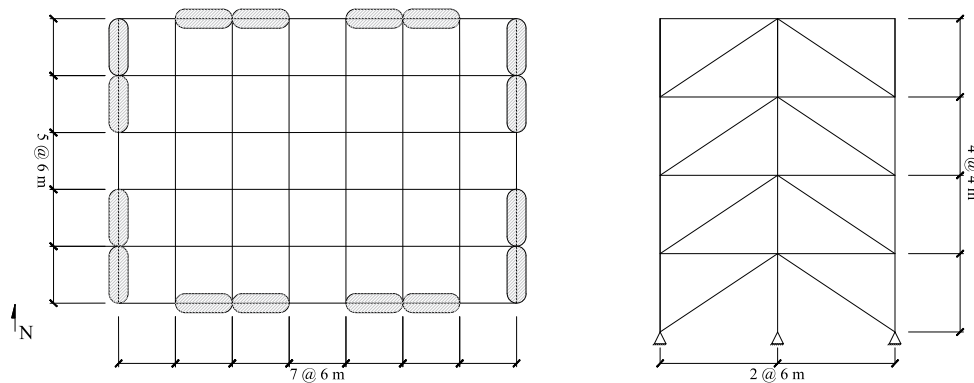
Plan configuration of the buildings and elevation of the considered SFRS (4-storey frame shown)
